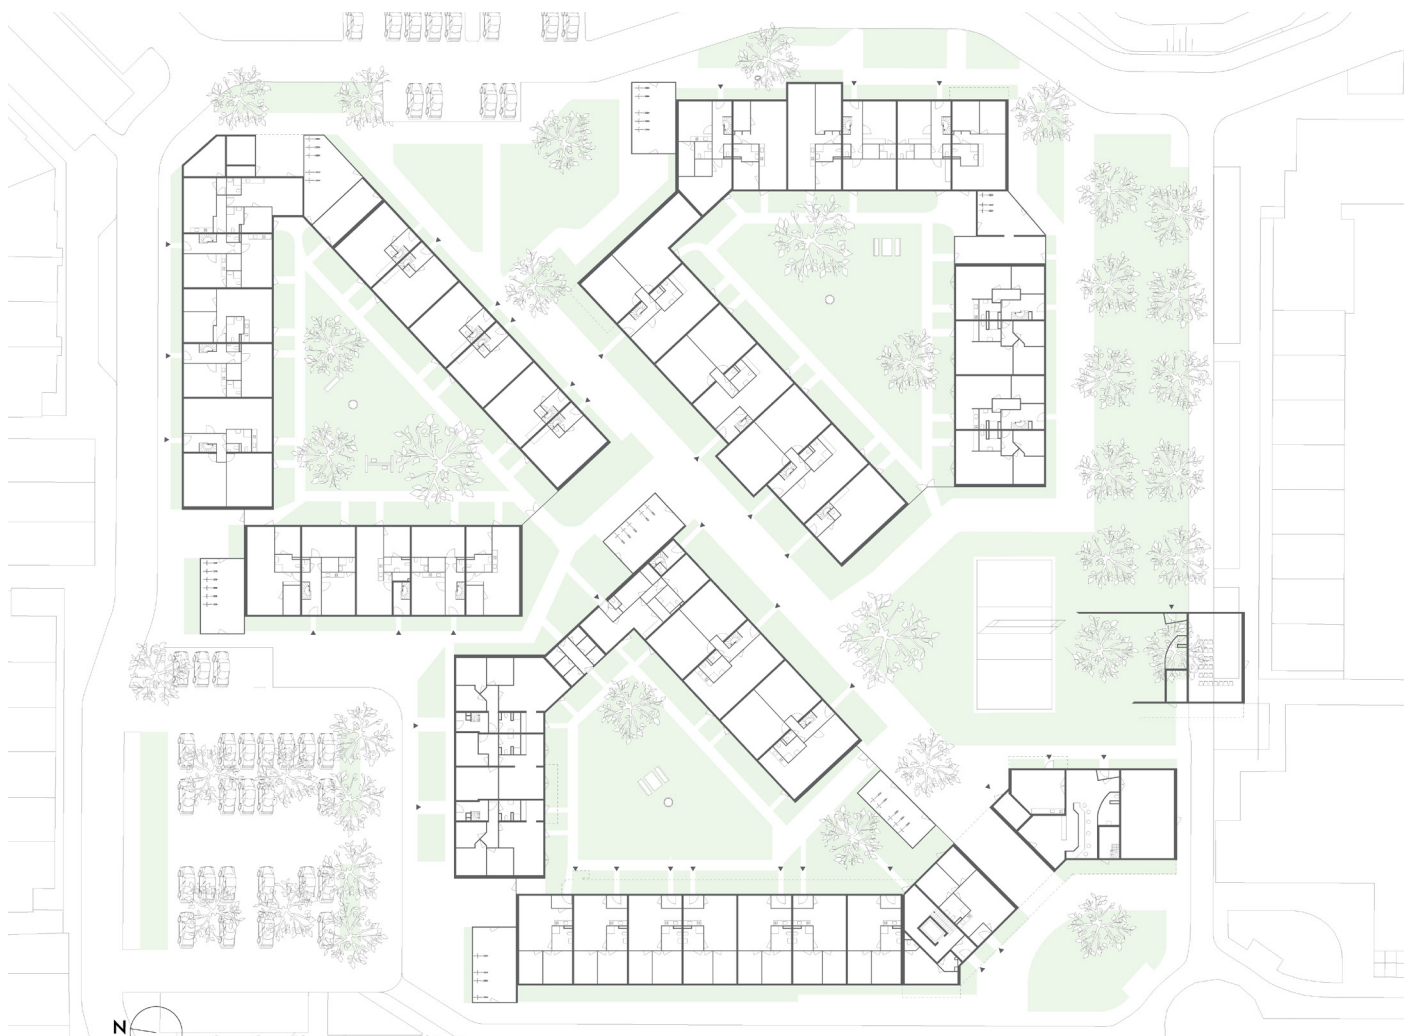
Floor Plan (ground floor) after transformation, Ground Floor (DUS Architecten, 2012).
